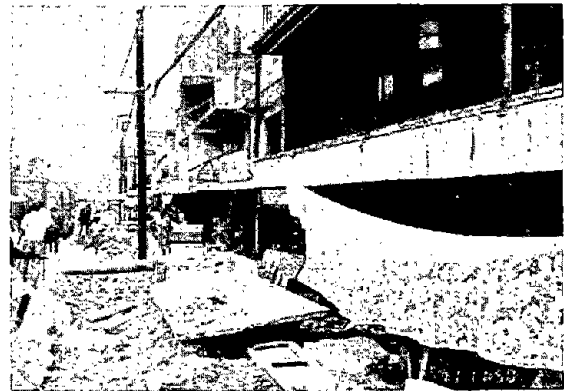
Damage along Angel Fernandez Avenue. The road was cracked by 1 meter on the north side of the street (right side). An electric pole was snapped and the buildings subsided by about 1 meter.
